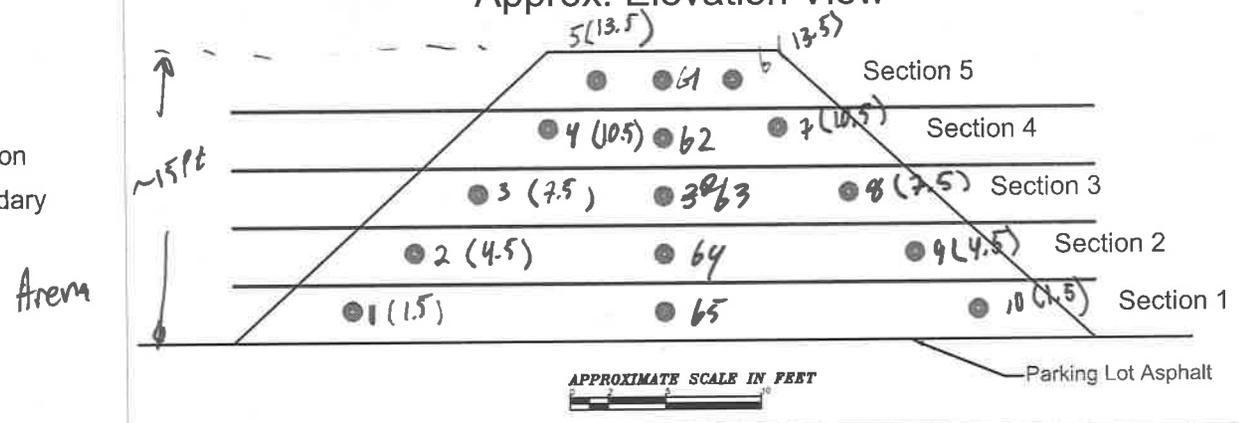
Stockpile A Layout & Proposed Sample Locations
